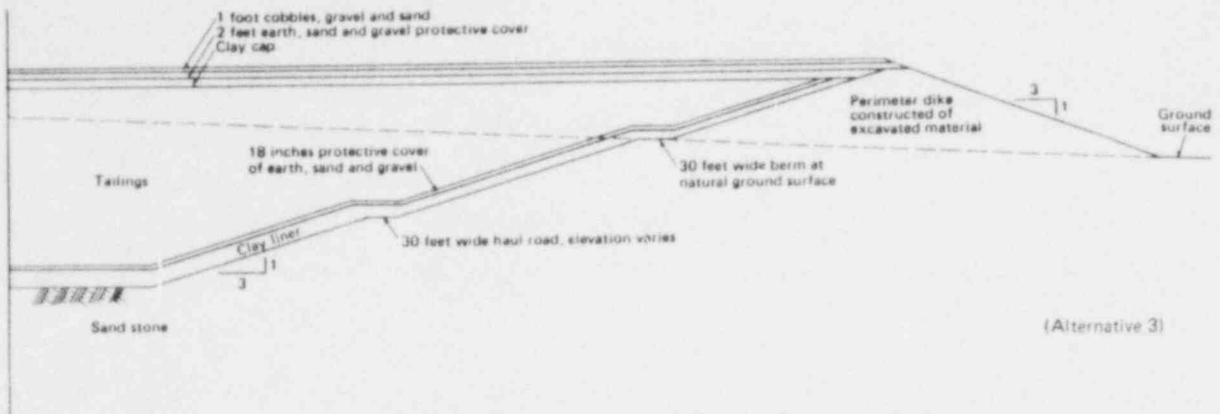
Tailings containment structure for the Shooting Canyon Uranium Project: combined excavated pit and dike. Source: Plateau Resources, Ltd., *Tailings Management Plan, Proposed Ore Processing Facility, Shooting Canyon Uranium Project, Utah*, prepared by Woodward-Clyde Consultants, San Francisco, Calif., Rev. June 1978, Fig. 4.
